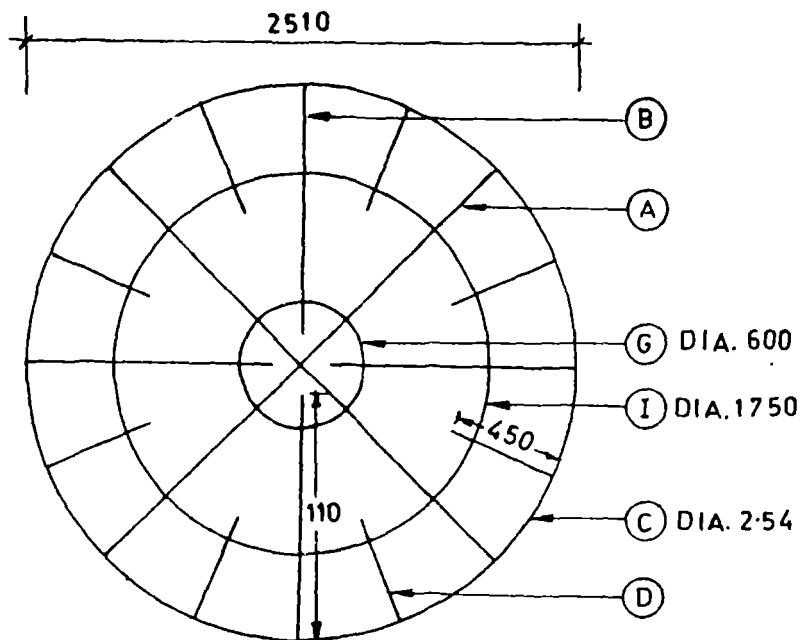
DETAILS OF SKELETAL STEEL FOR ROOF
